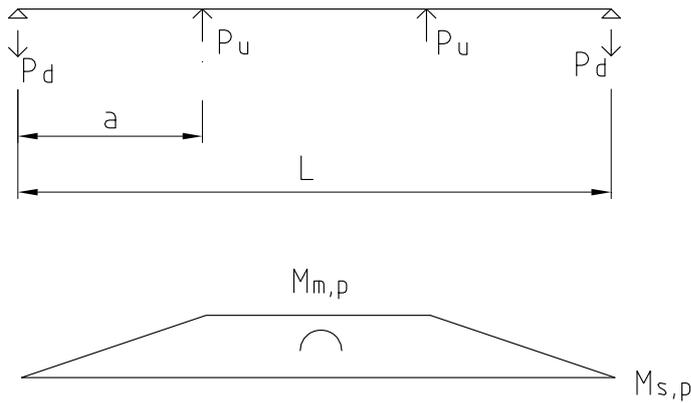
Structural schematisation of the box girder subjected to prestressing forces
